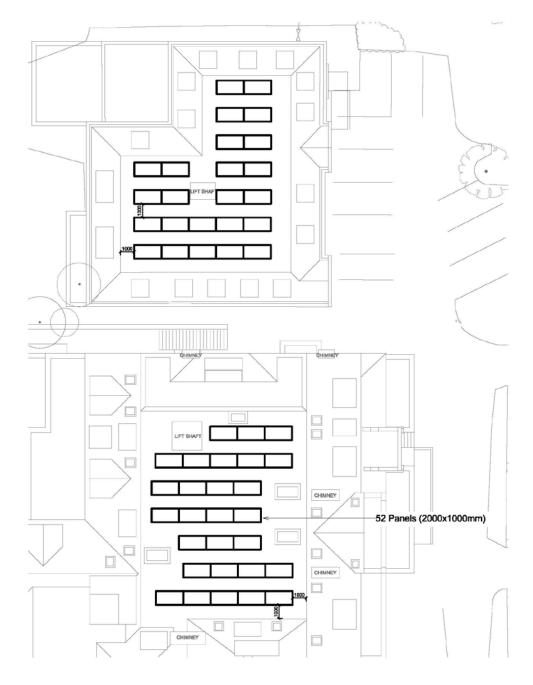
Roof layout showing proposed PV panels on the Roof (south facing)
